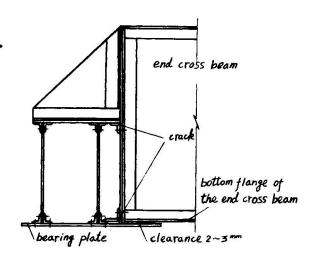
Fatigue cracks occuring at the connecting angles
